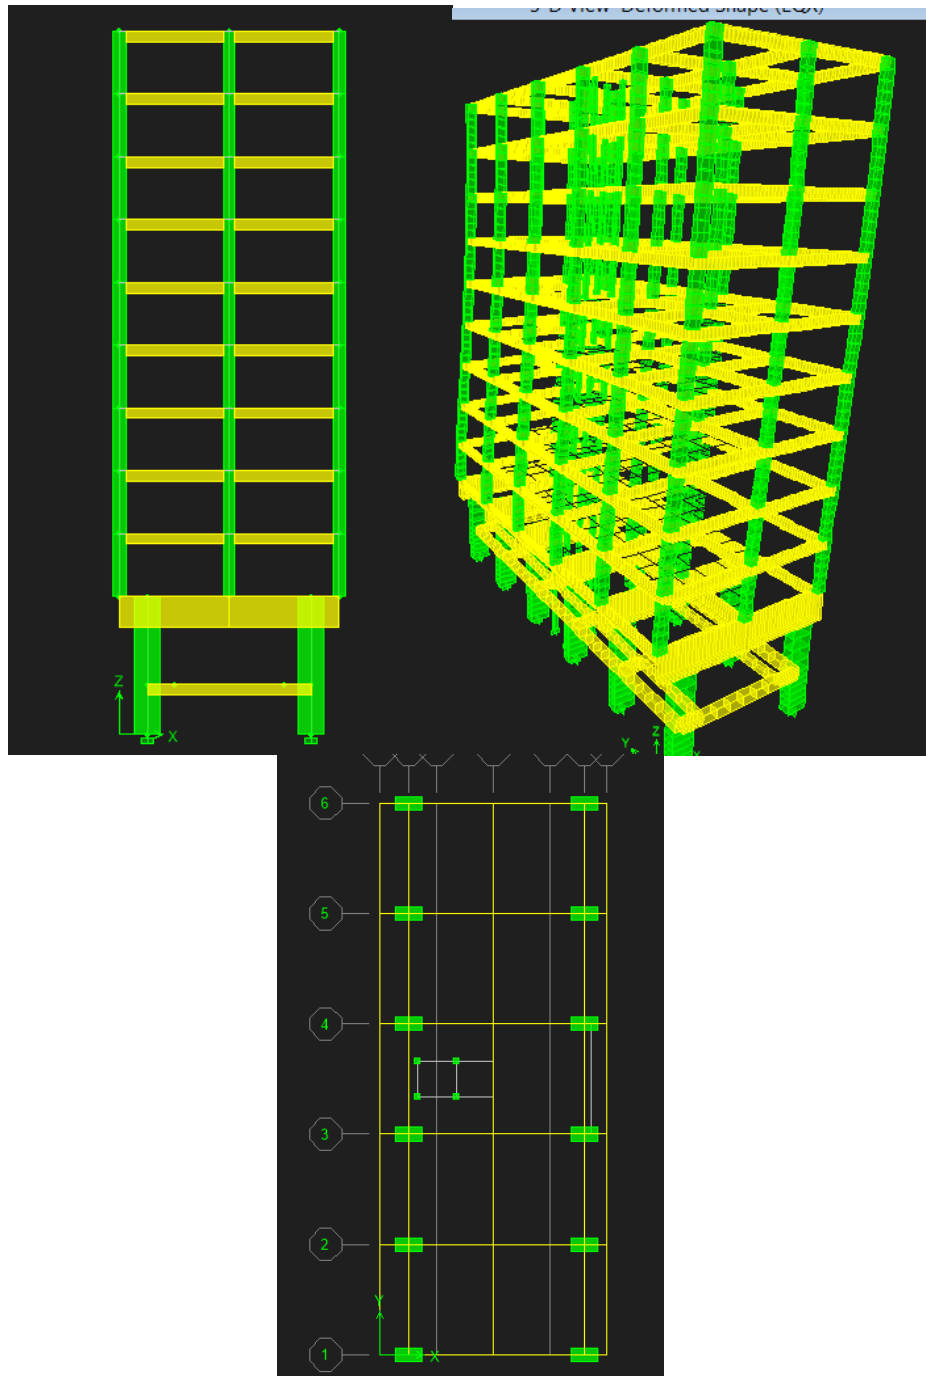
Elevation view, 3D view and ground floor plan view of case 2
